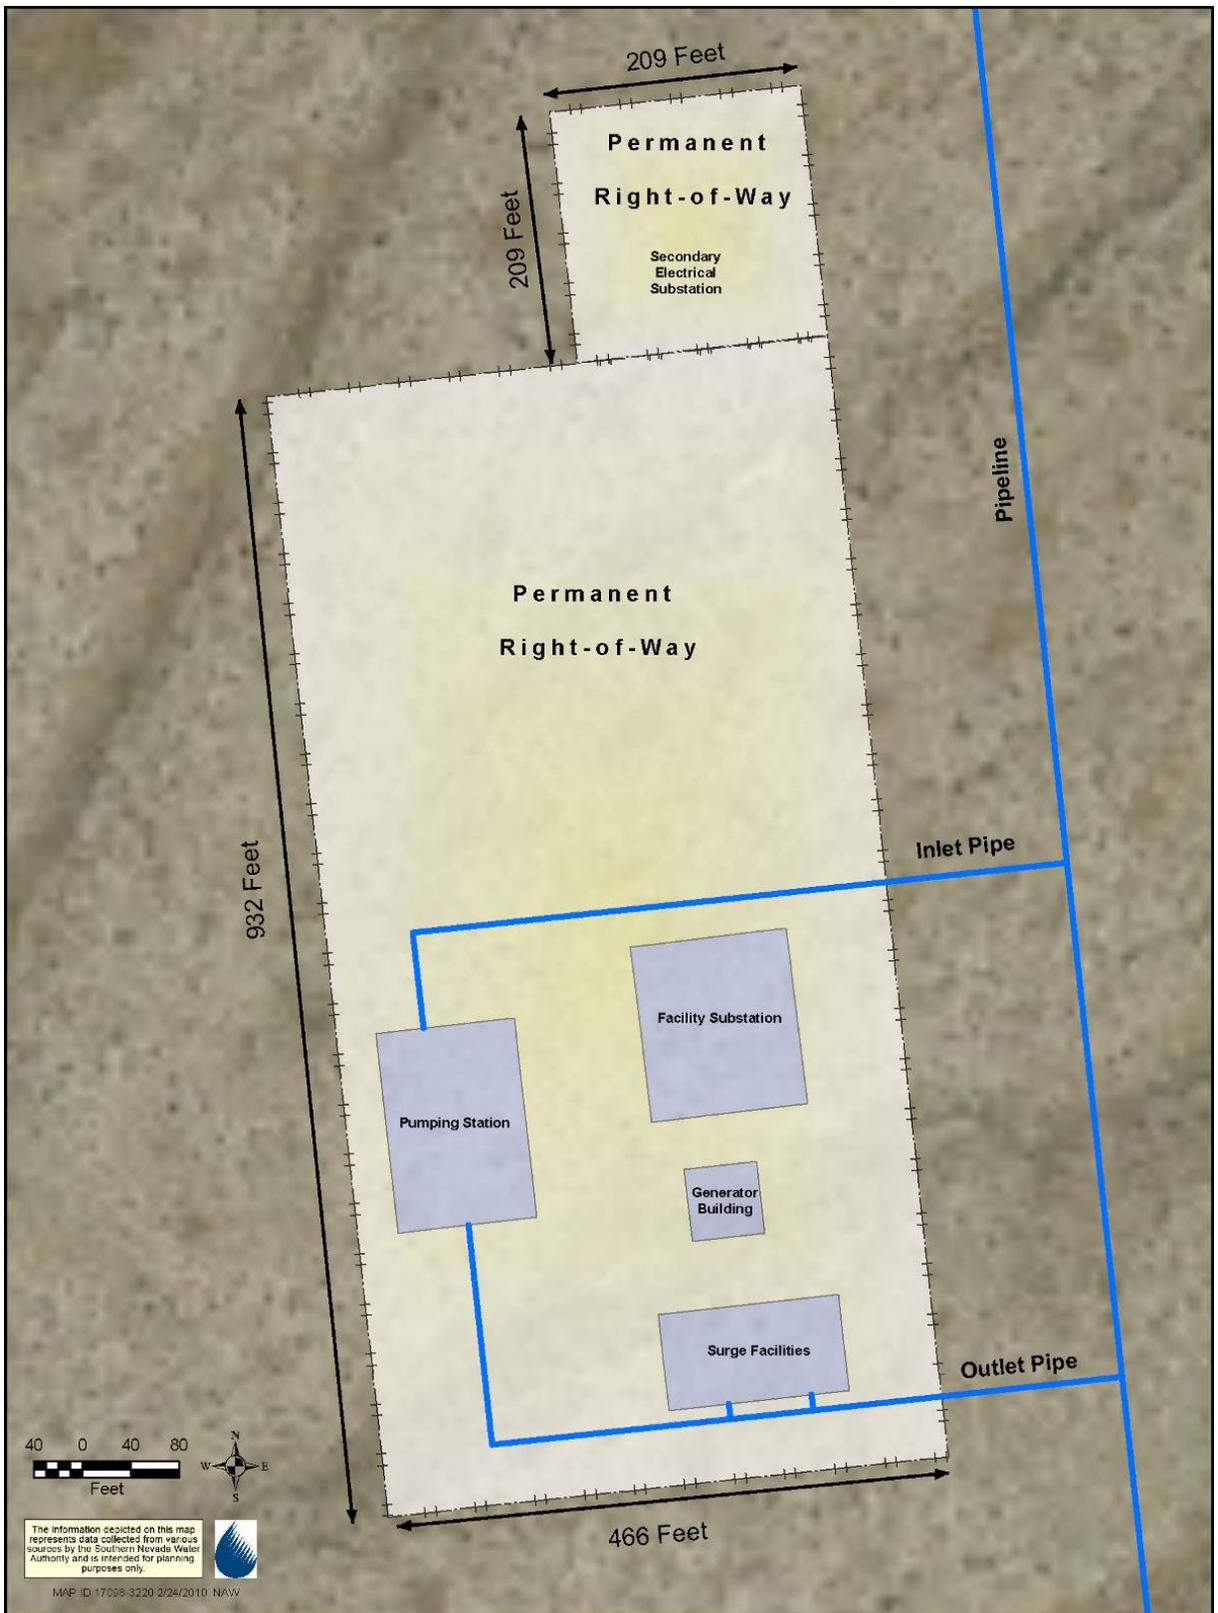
Preliminary Snake Valley South Pumping Station Site Plan
